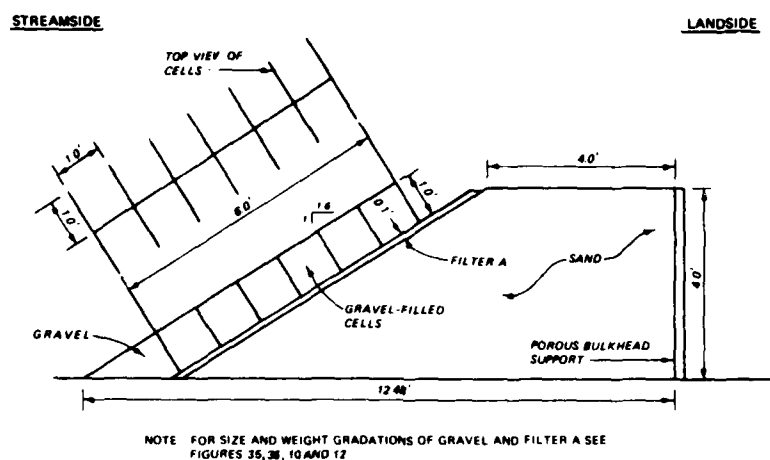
Plan 8B, sand streambank with gravel-filled cells and filter (one well-graded rock layer) protection
